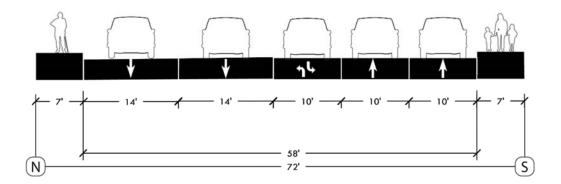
Street Cross-Section, east end typical (SR 99 to 44<sup>th</sup> Avenue W)
